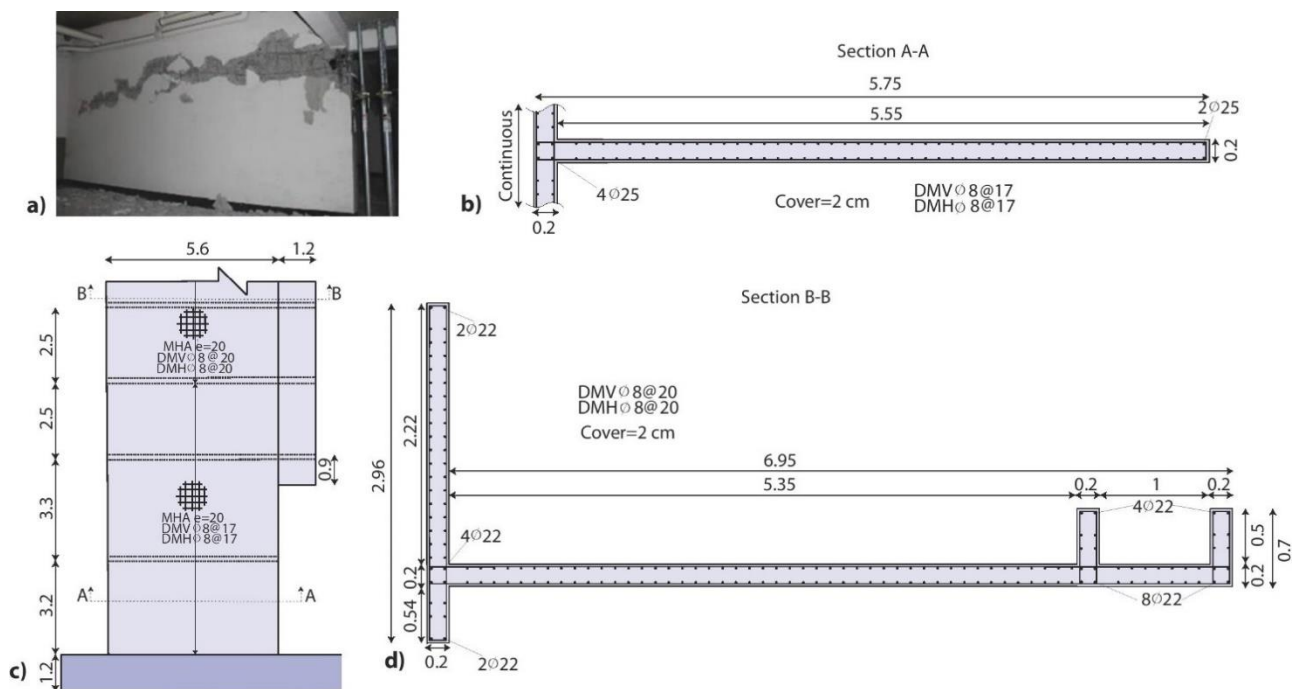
a) Wall at axis Q damaged after earthquake Jünemann et al [8]; b) Section A-A of wall at axis Q (dimensions in m); c) Structural specifications wall at axis Q (dimensions in m); d) Section B-B of wall at axis Q (dimensions in m)
